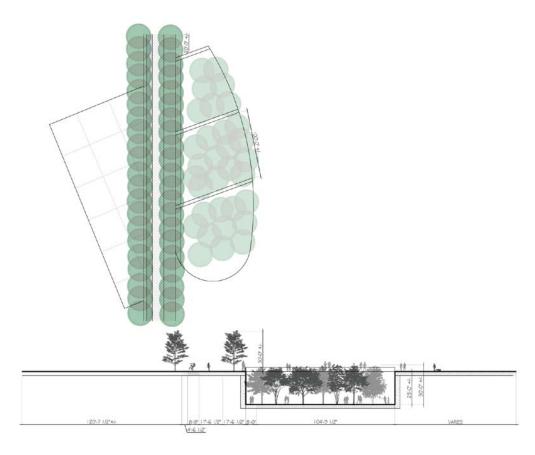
Parc de la Villette Plan and Section of Bamboo Garden (Source: author)
